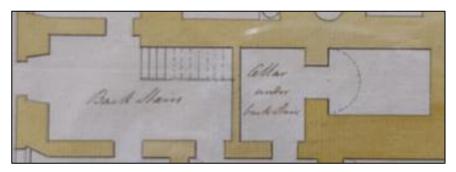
Extract from the 1780s plan of the building, ground floor of Cell F
